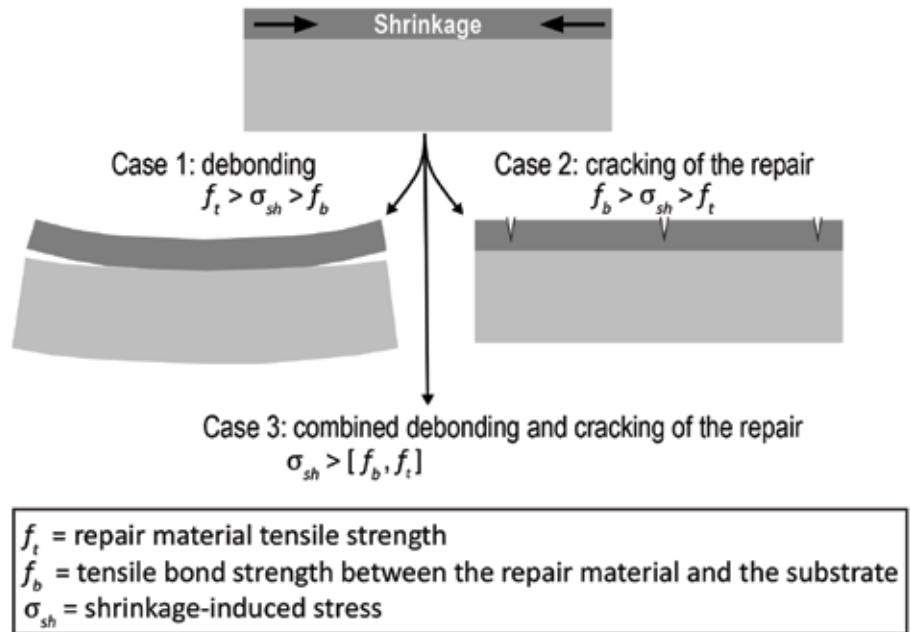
Damage mechanisms in concrete repair systems (adapted from Luković et al.⁴)
